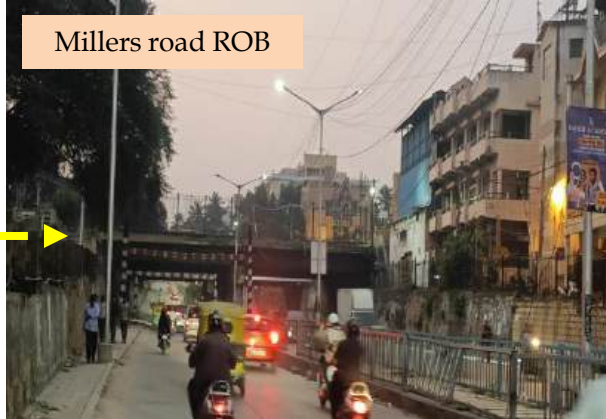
Proposed Elevated corridor from Yeshwanthapura to Halasur lake on Old Madras road Site inspection photos
